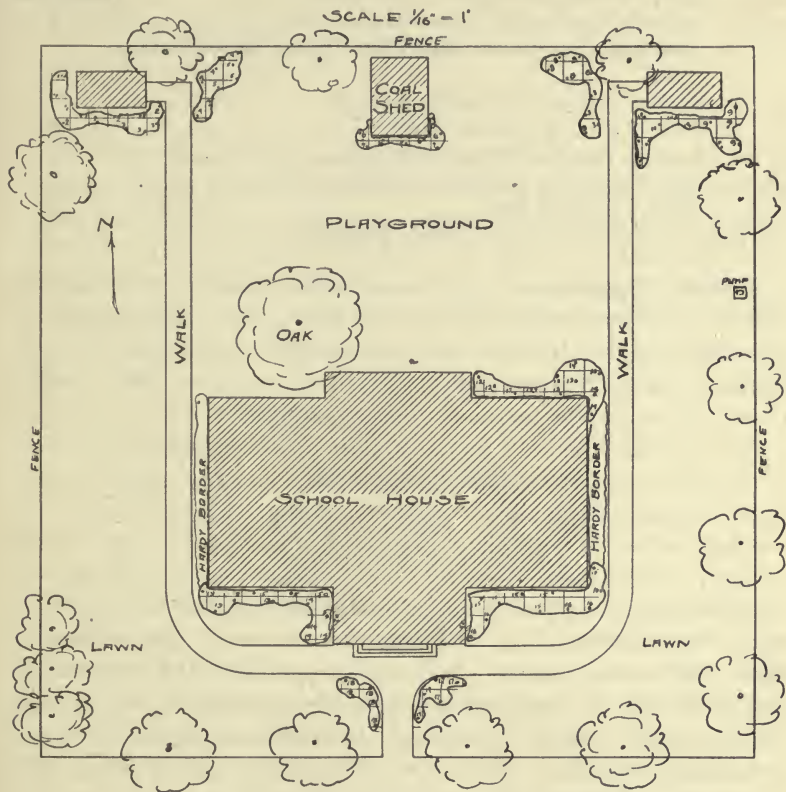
PLAN FOR SCHOOL GROUNDS.
